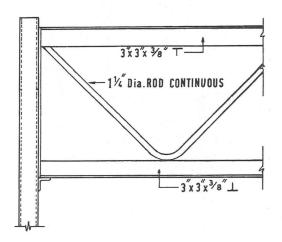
Whittinghame College, Brighton. Detail of the welded roof truss over the hall
